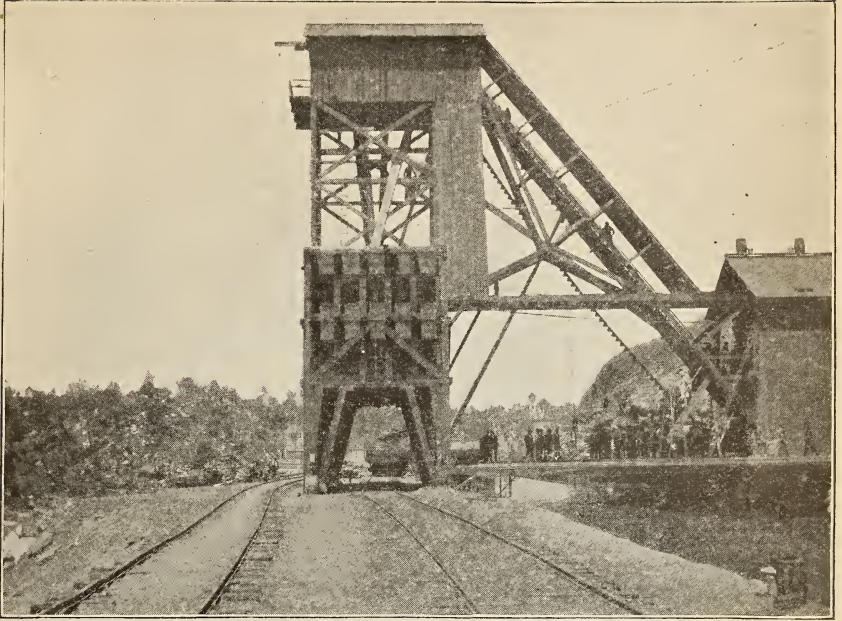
California road improvement. Folsom State Prison. Elevator, screens, and storage bunkers.
